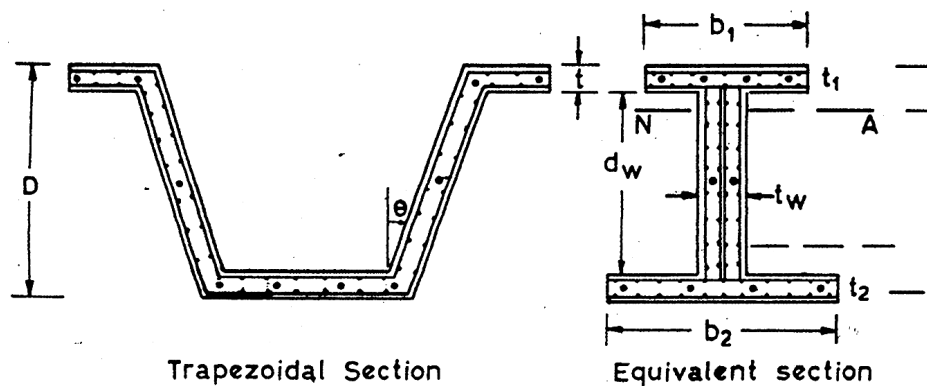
Trapezoidal roofing elements – Actual cross-section and its equivalent section.
